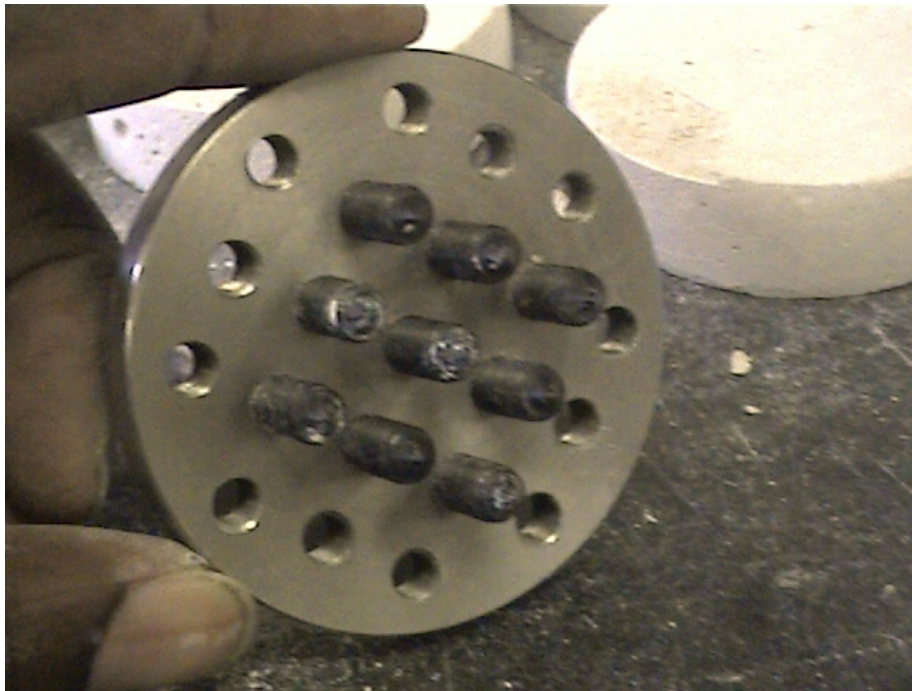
Load Assembly showing “9” Point Head Shear Stud Arrangement.
